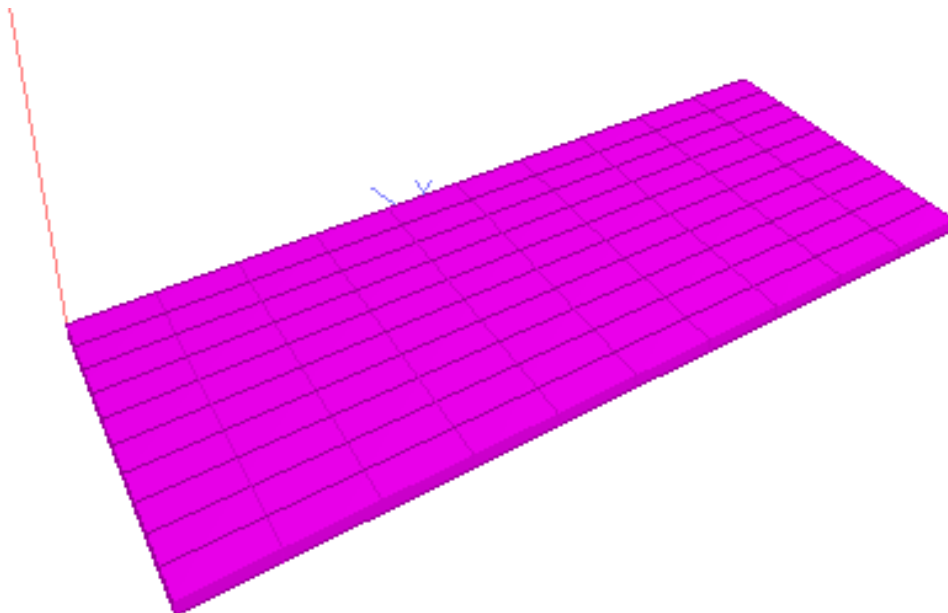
3D view of slab with 17m span length at 15° skew Angle
